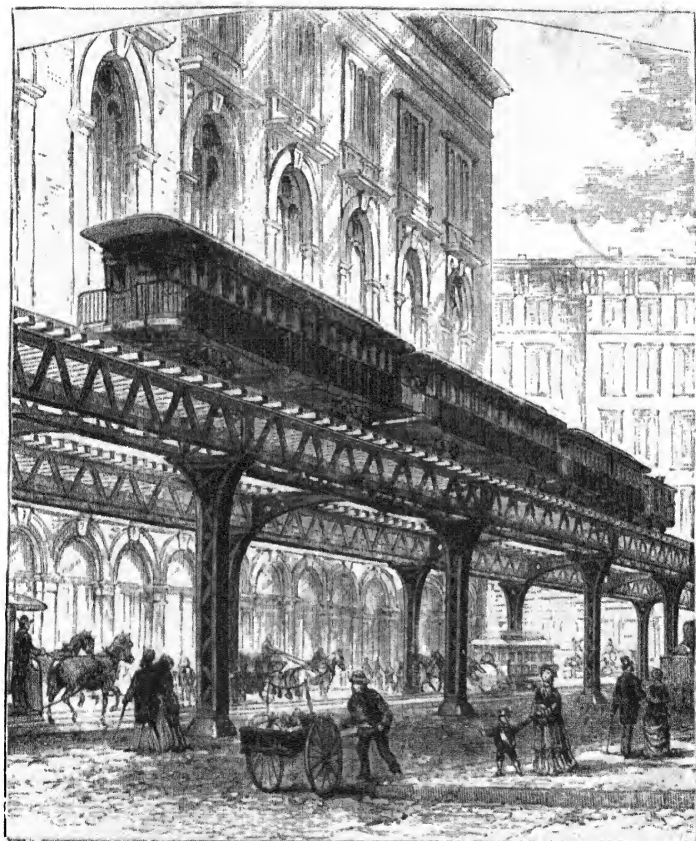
AN ELEVATED STREET RAILWAY, NEW YORK.
